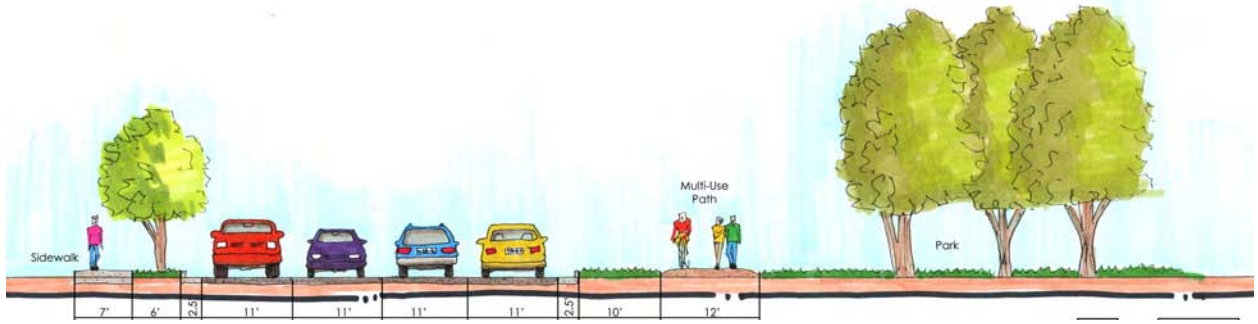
Possible cross-section for Atlanta Street between Azalea / Riverside Drive and the Allenbrook Roundabout (Alternative 2)
